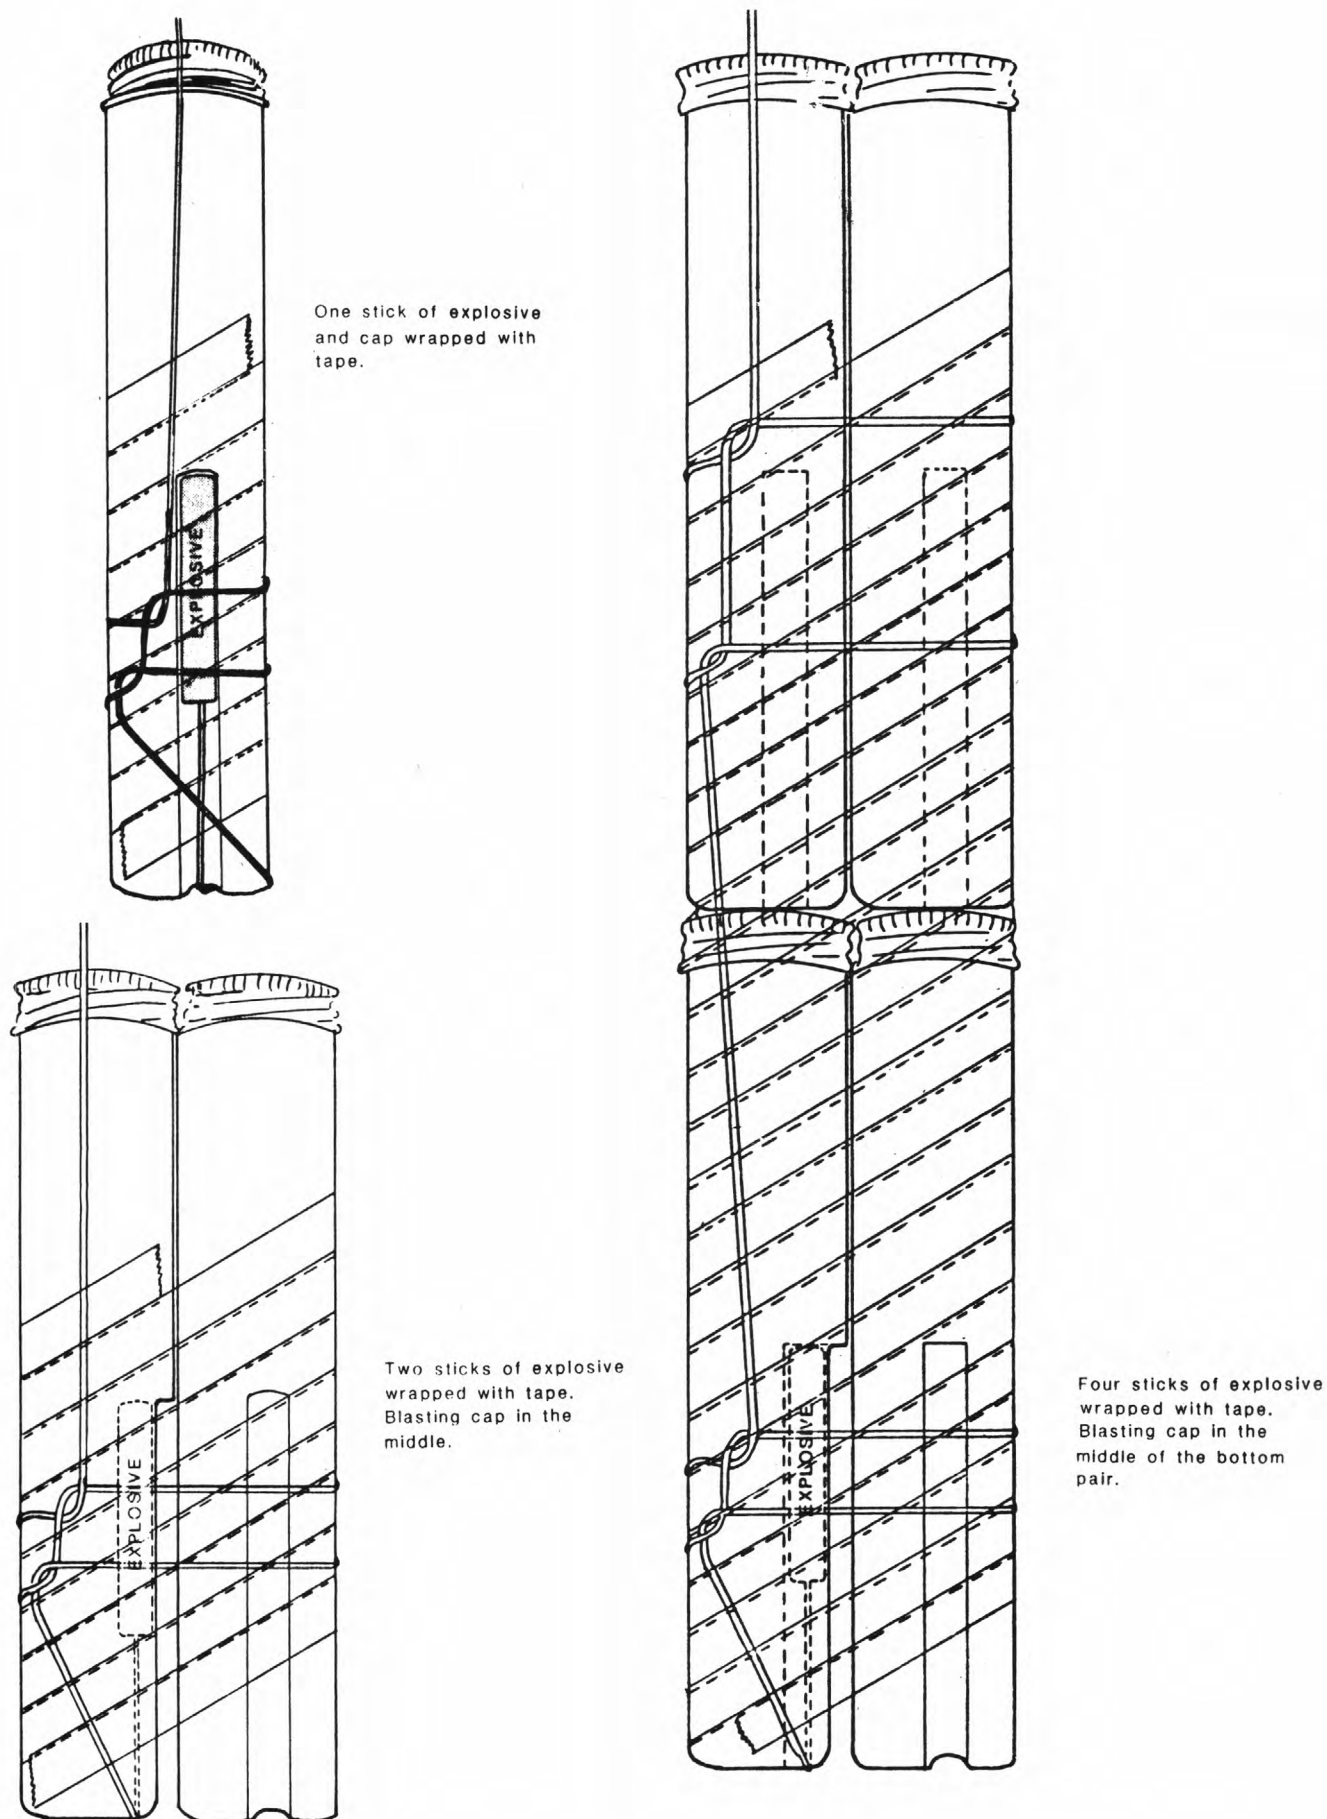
Assembly of explosive cartridges and electric blasting caps.
